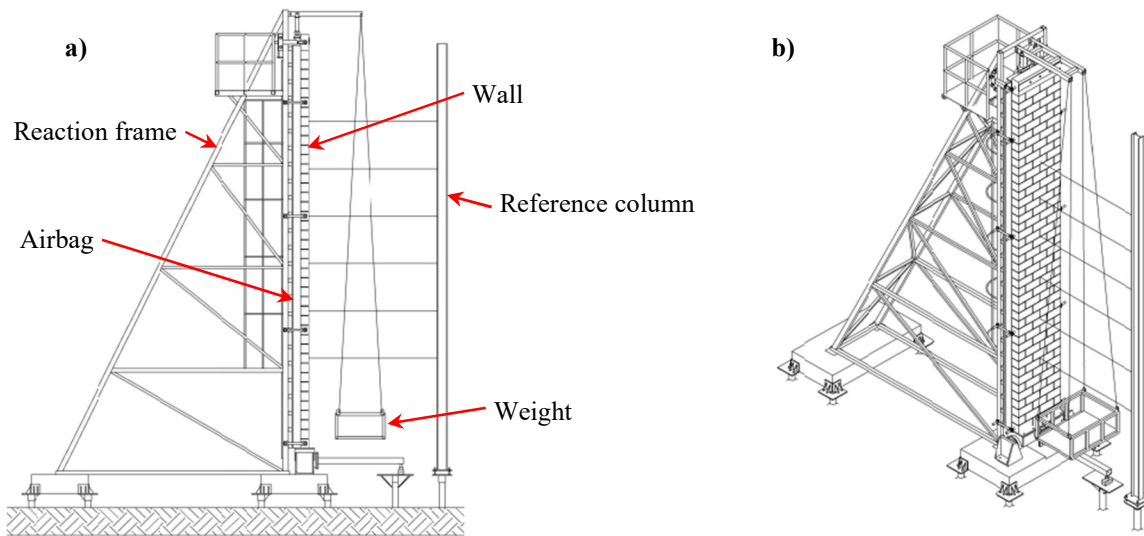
3D Test setup for testing slender masonry walls: (a) Lateral view; (b) Isometric.
